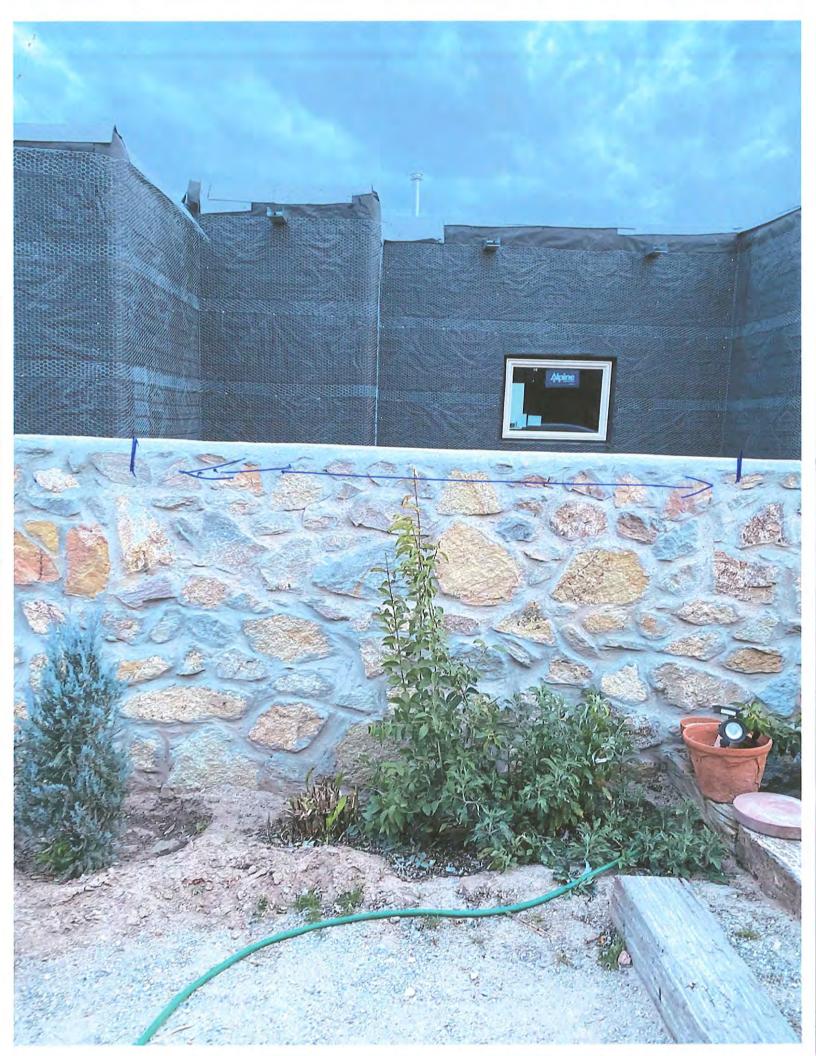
PHOTO OF THE SUBJECT DWELLING FROM CALLE DE COLON
